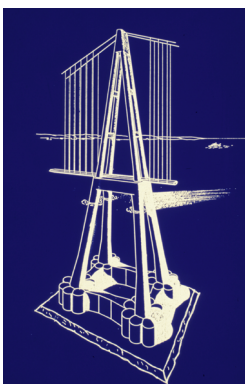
Off shore type bridge pier concept for 300 m water depth.
